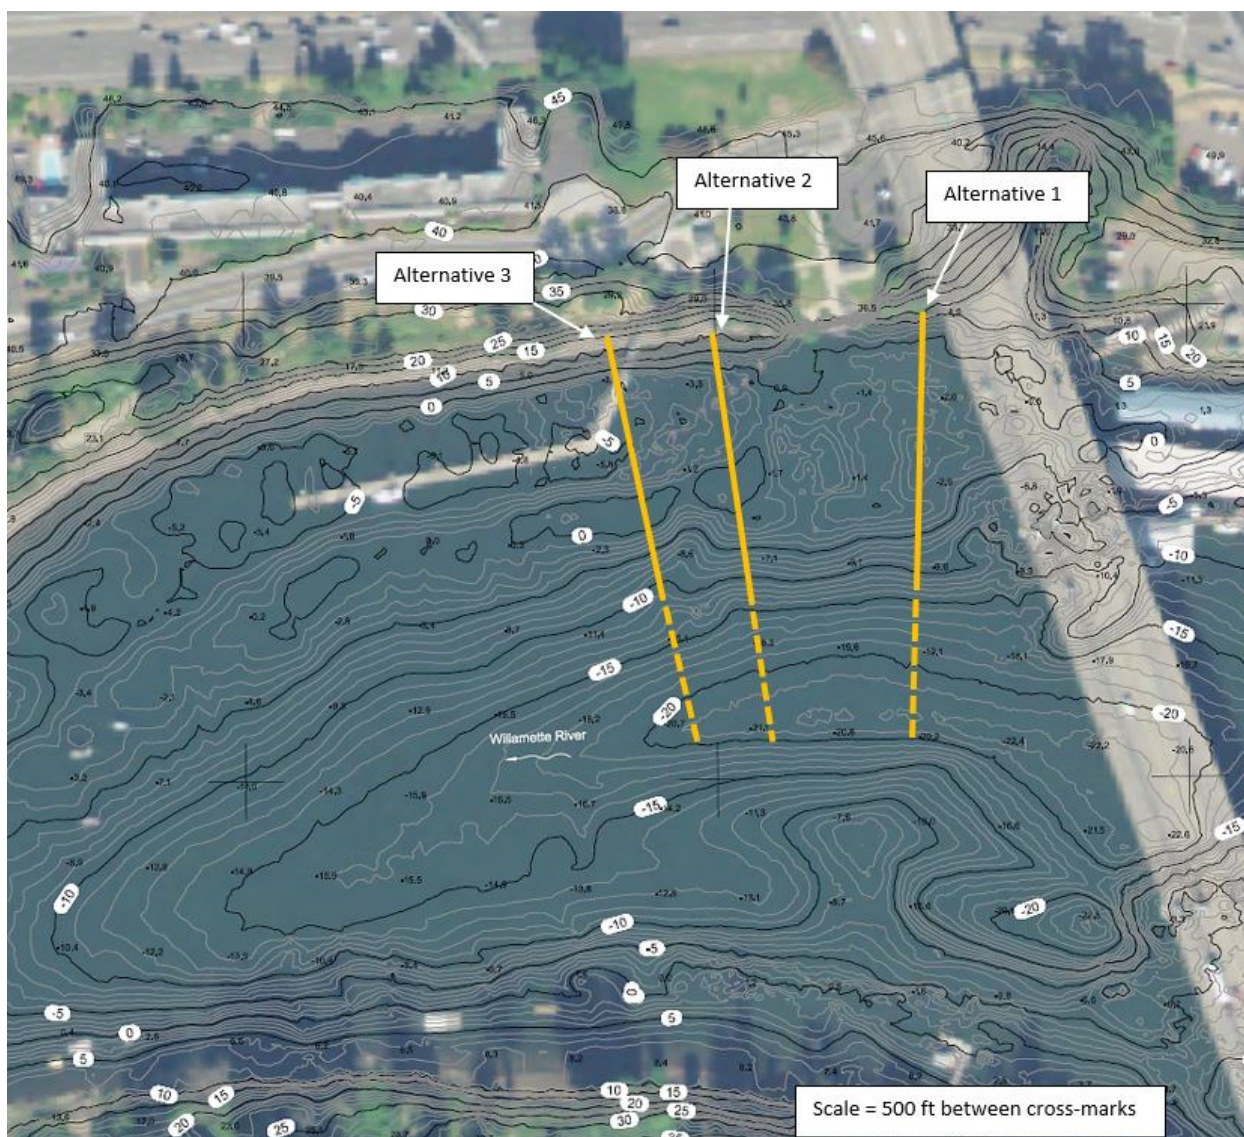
Locations of Proposed Diffuser Site/Outfall Route Alternatives in the Willamette River
